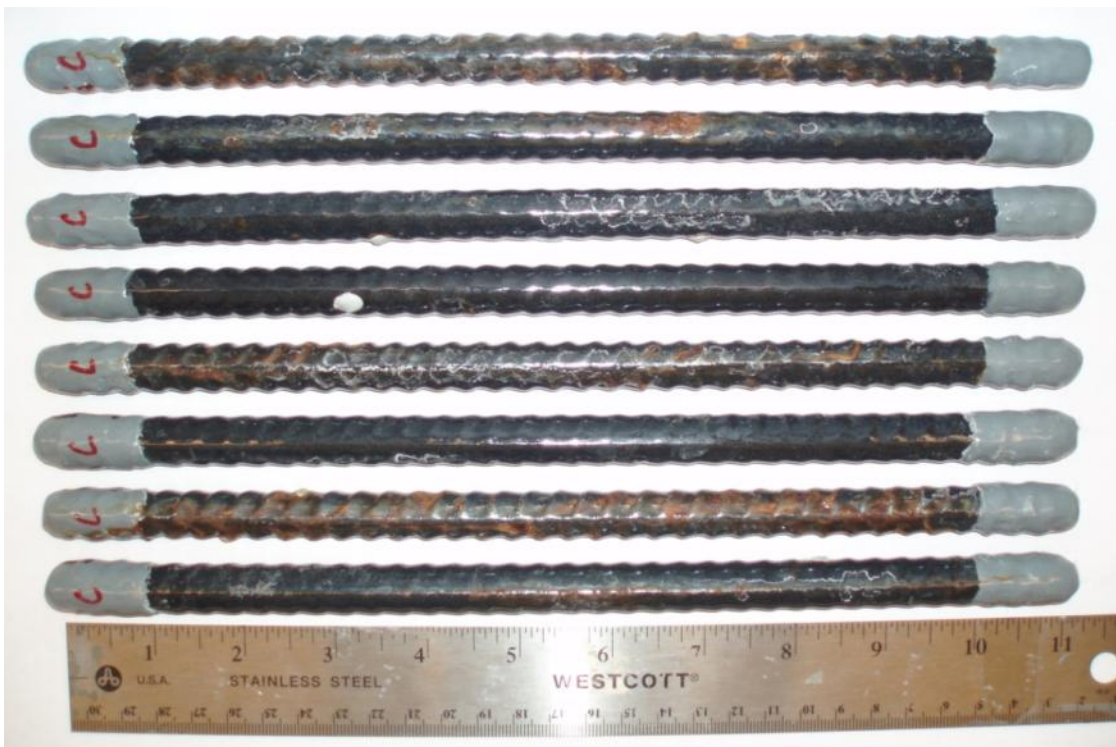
Backside of the deformed pure enamel-coated salt spray specimens after testing.
